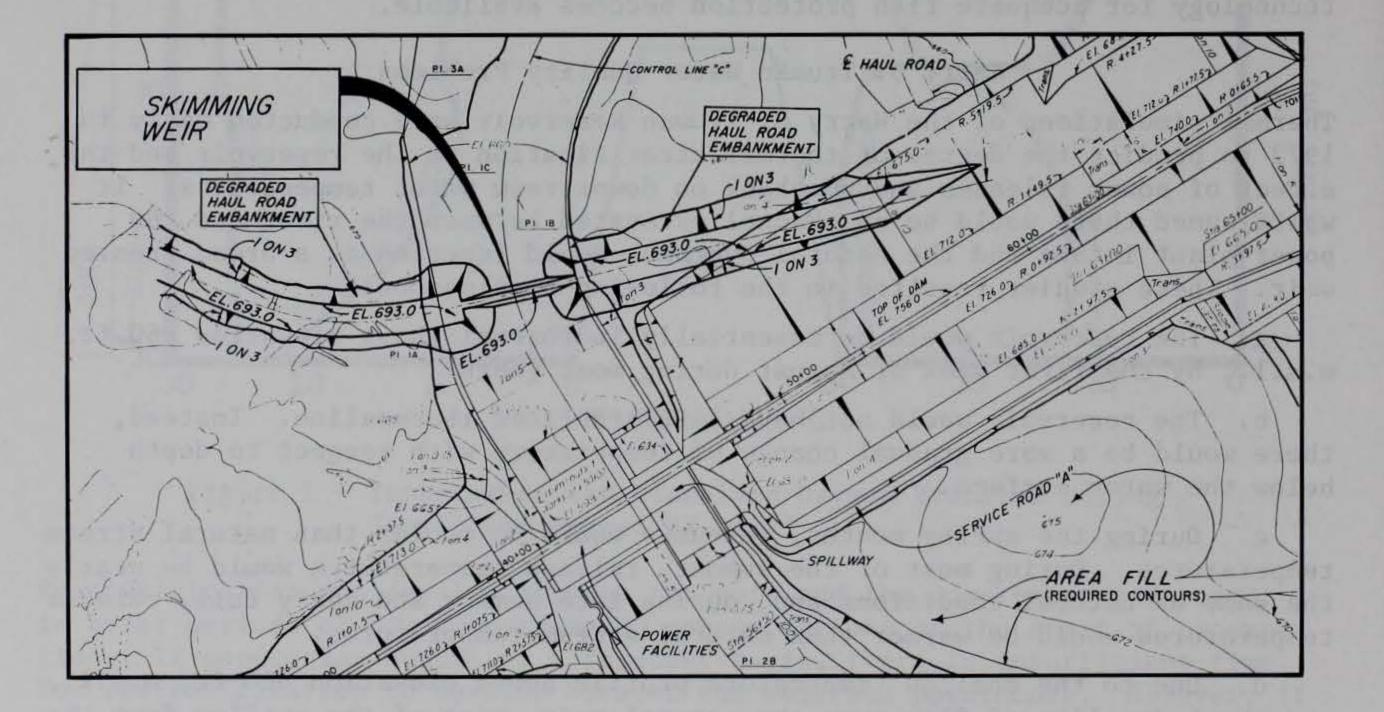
Plan View of Harry S. Truman Dam and Upstream Skimming Weir
